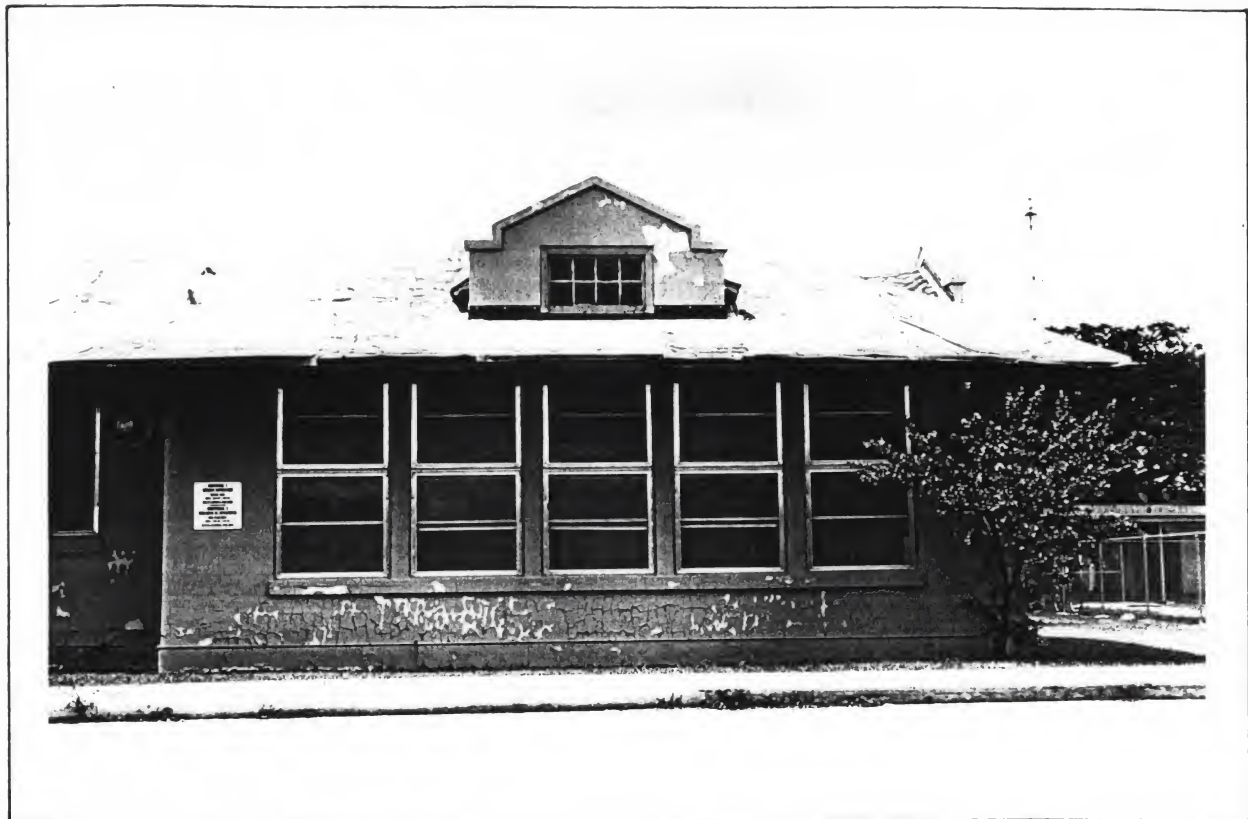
REDLAND ELEMENTARY SCHOOL, SOUTH ELEVATION, RIGHT SIDE.
